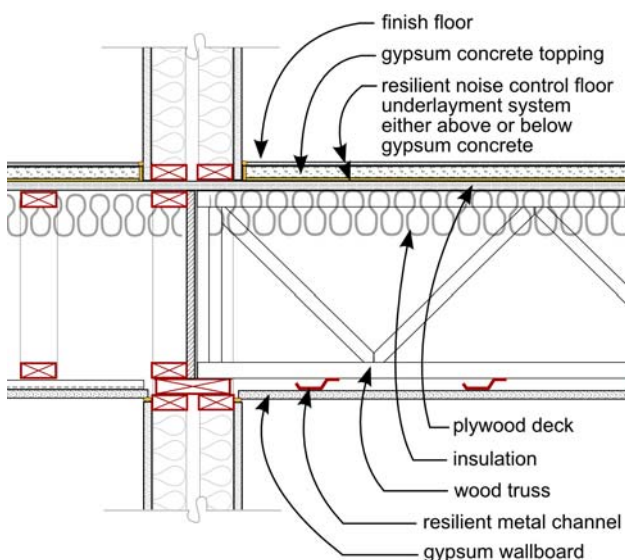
Basic wood truss floor-ceiling assembly with insulation and resilient metal channels.
